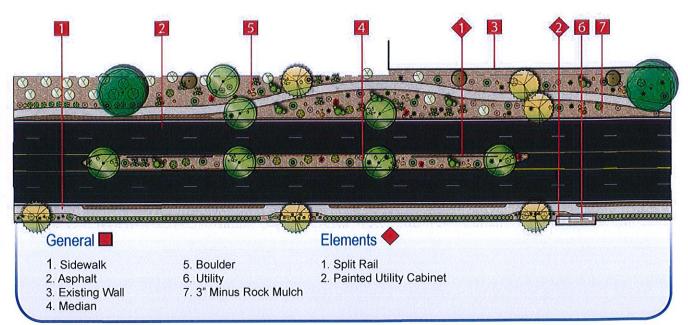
"Good" Rural Elegance Conceptual Streetscape Plan
